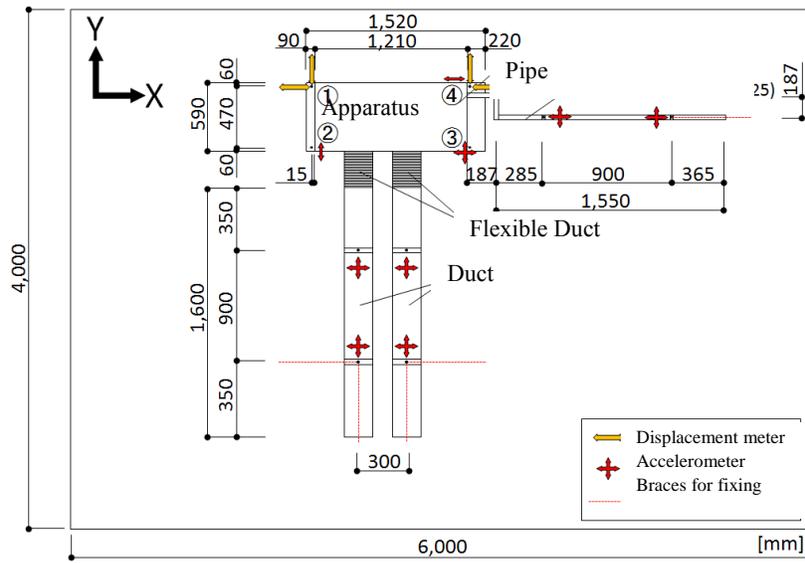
Plan view of specimen (apparatus-duct-pipe system).
